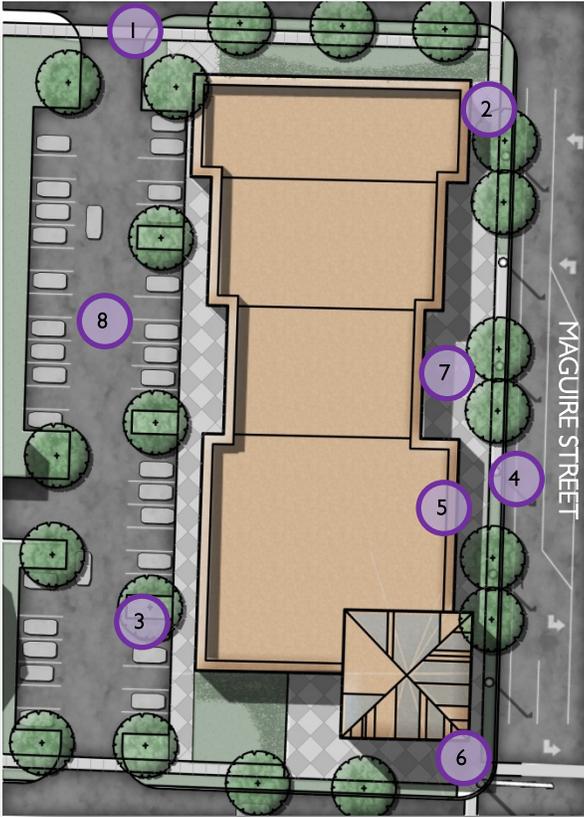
Commercial Infill / Redevelopment Site Plan
